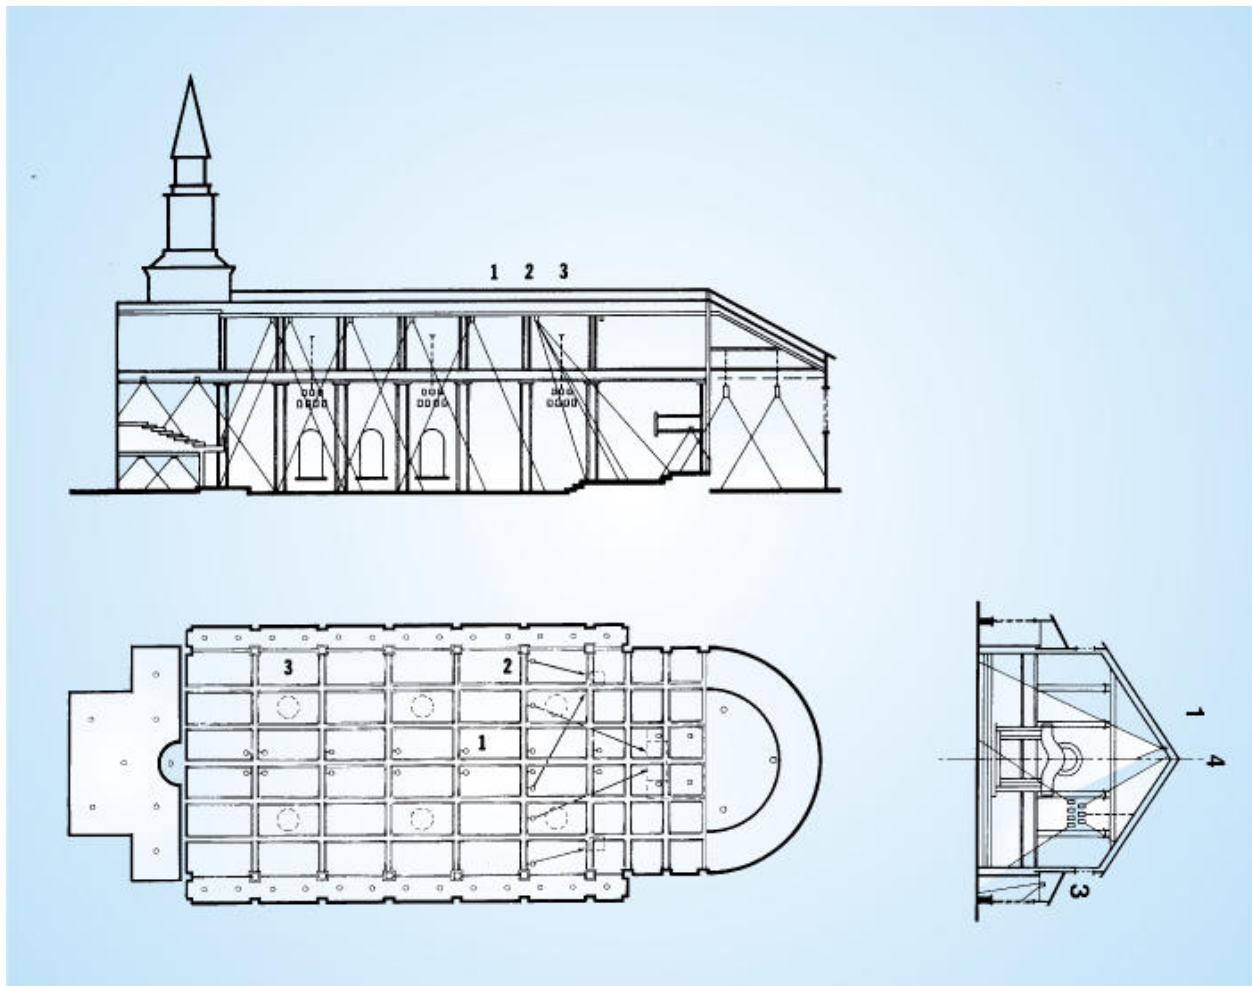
A possible lighting system for a modified traditional church: (1) Task reading light from bracketed downlights. (2) Accent lighting with bracketed spotlights. (3) Architectural light with uplighting in a chandelier and side-aisle wall washers. (4) Celebration light with controlled adjustable chandeliers.
